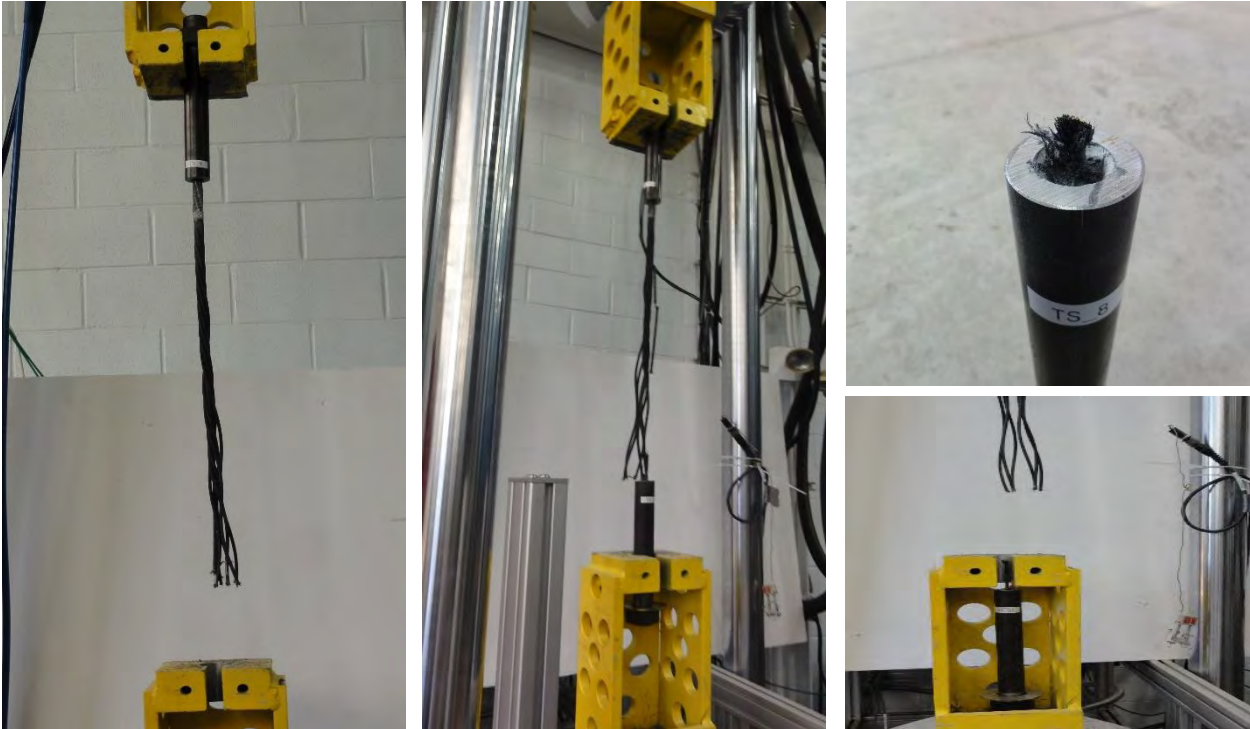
Typical failure mode of CFCC specimens with sleeve type anchorage
